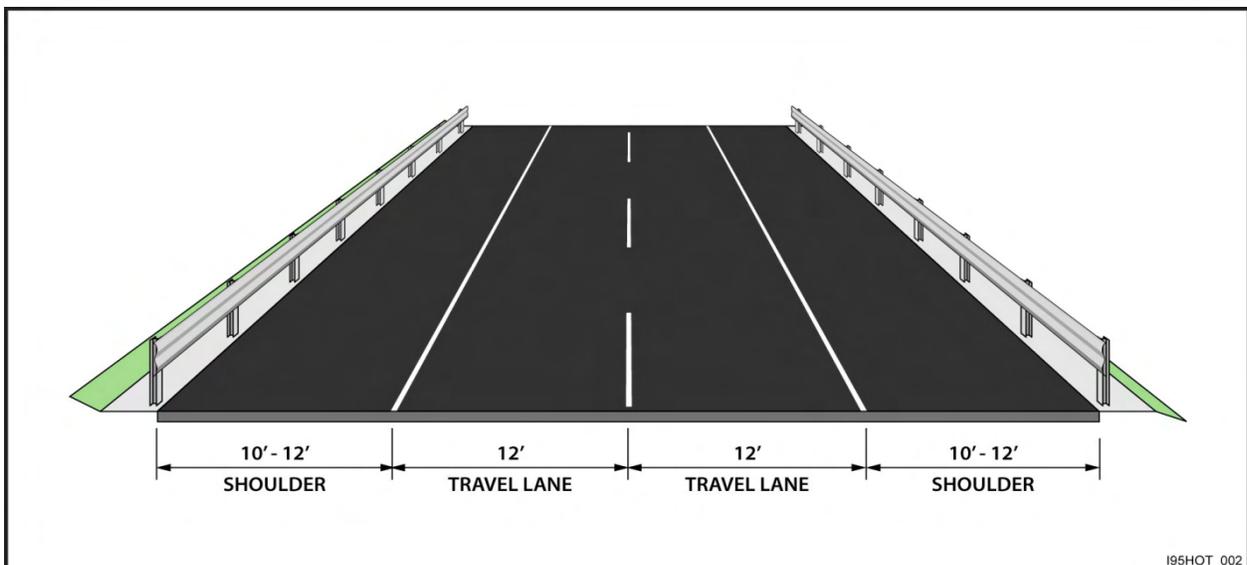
B. Typical Two-Lane Cross-Section – Existing Pavement
